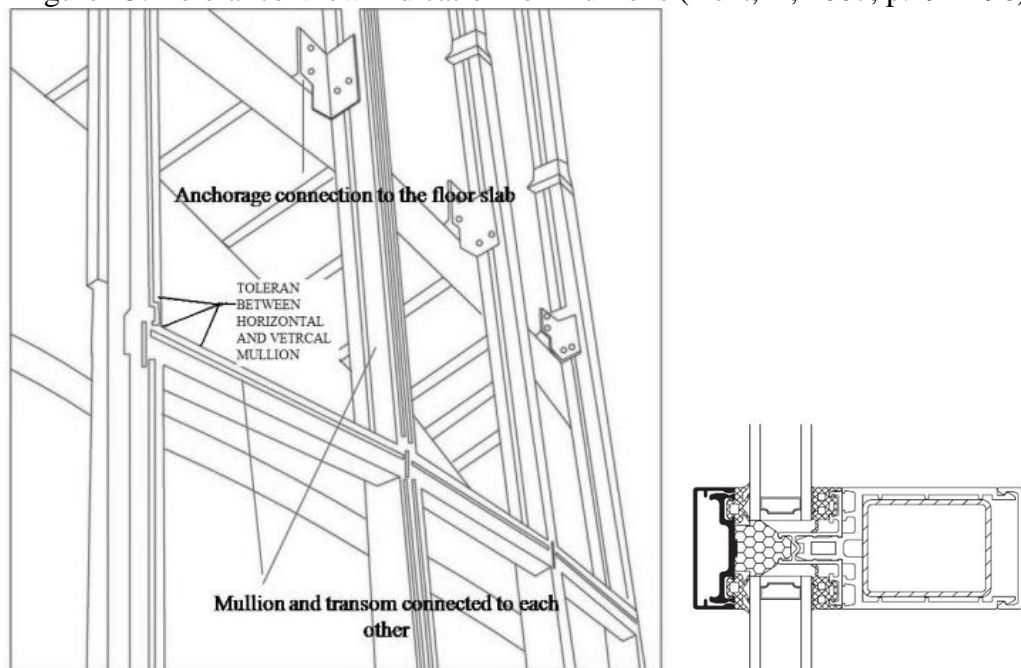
Tolerance View between Vertical and Horizontal Mullion Along the Connection Joint. The Sectional Drawing Shows the Mullion Cap Screwed to the Main Mullion (Drawn by Author).
